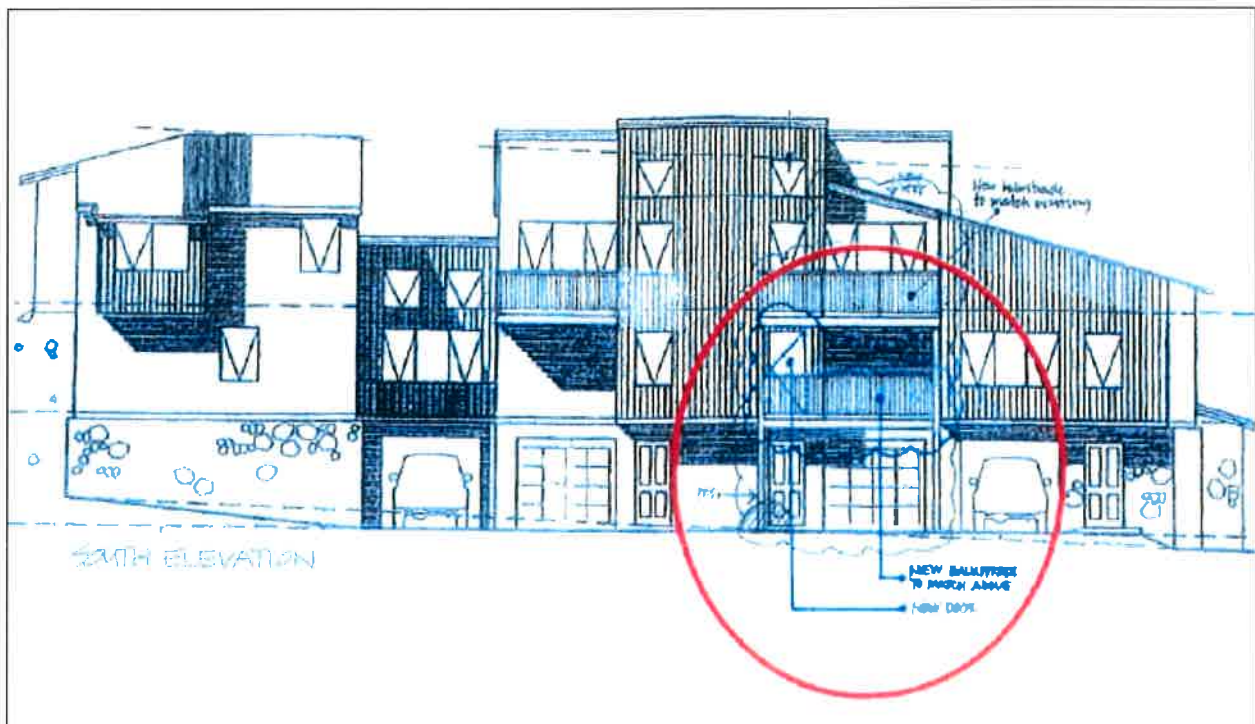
Southern elevation view of the proposed deck / spa location in blue (Source: Applicant's SEE)
